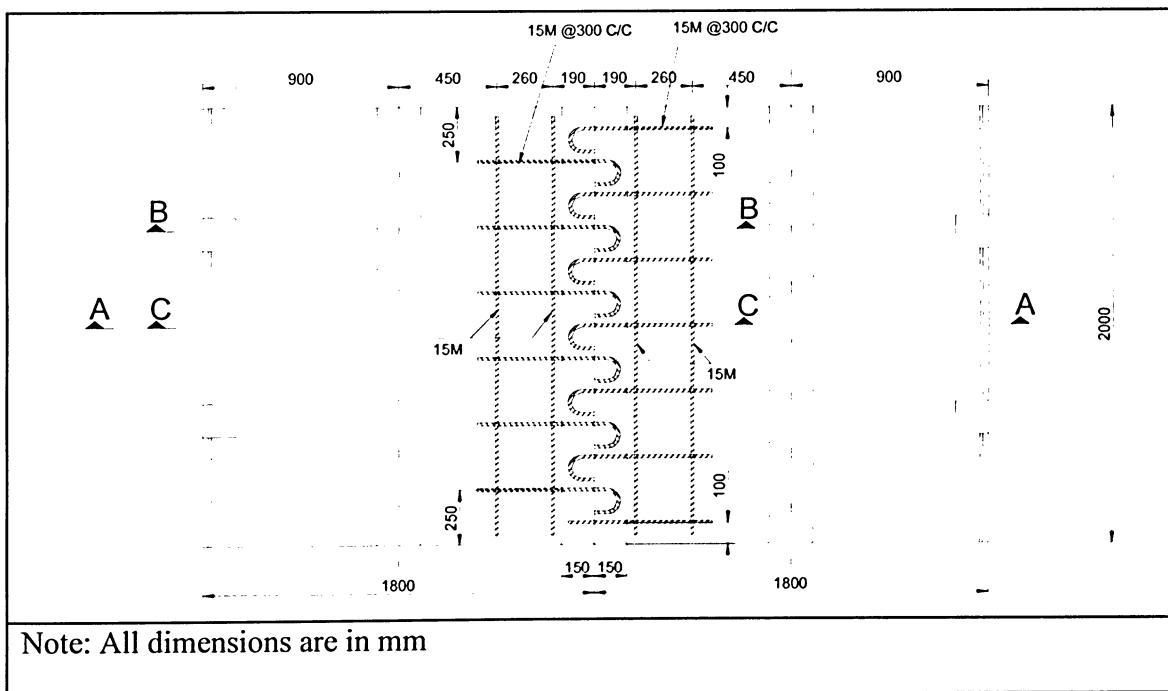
(b) Plan of Dowel Rebar Arrangement at Joint for Model M1
